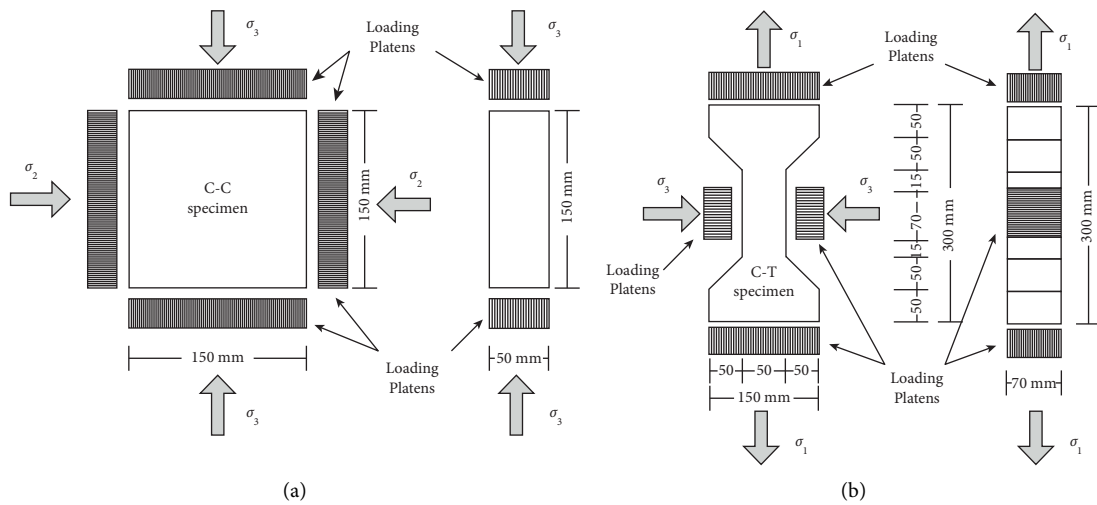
Geometric dimensions of RPC specimens used in the (a) C-C and (b) C-T tests.
